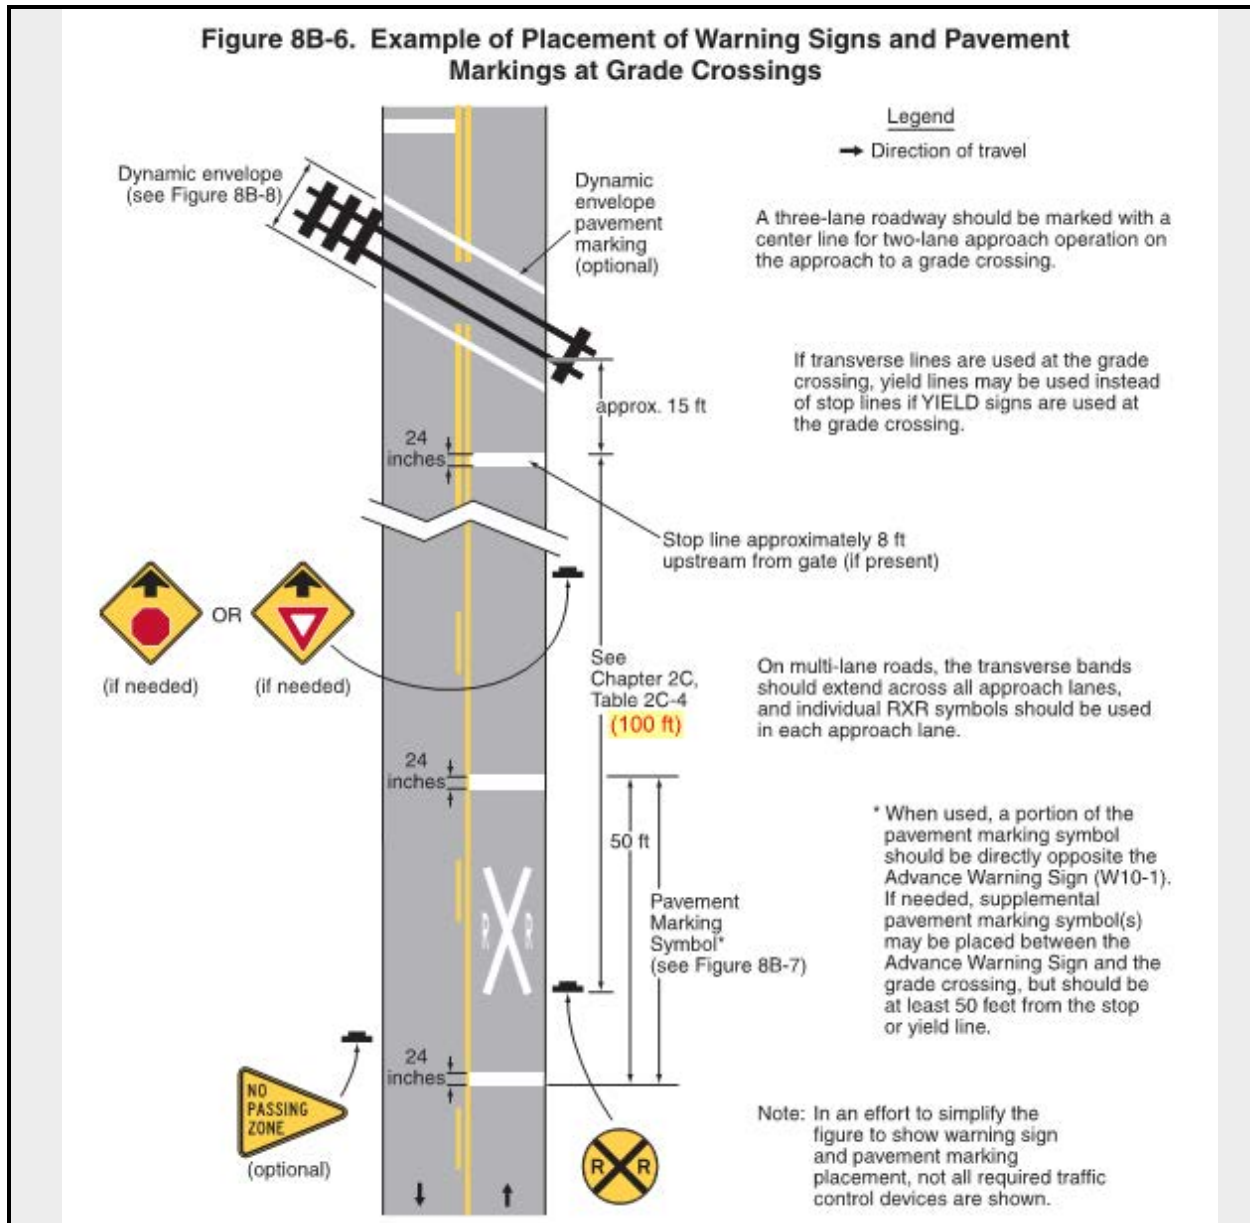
Railroad-Highway Crossing Signs and Pavement Markings Placement (MUTCD)
